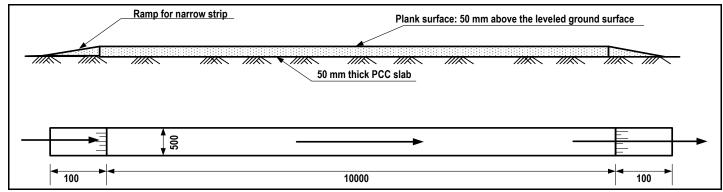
Narrow Plank test: PCC cast in-situ slab/Wooden Plank
